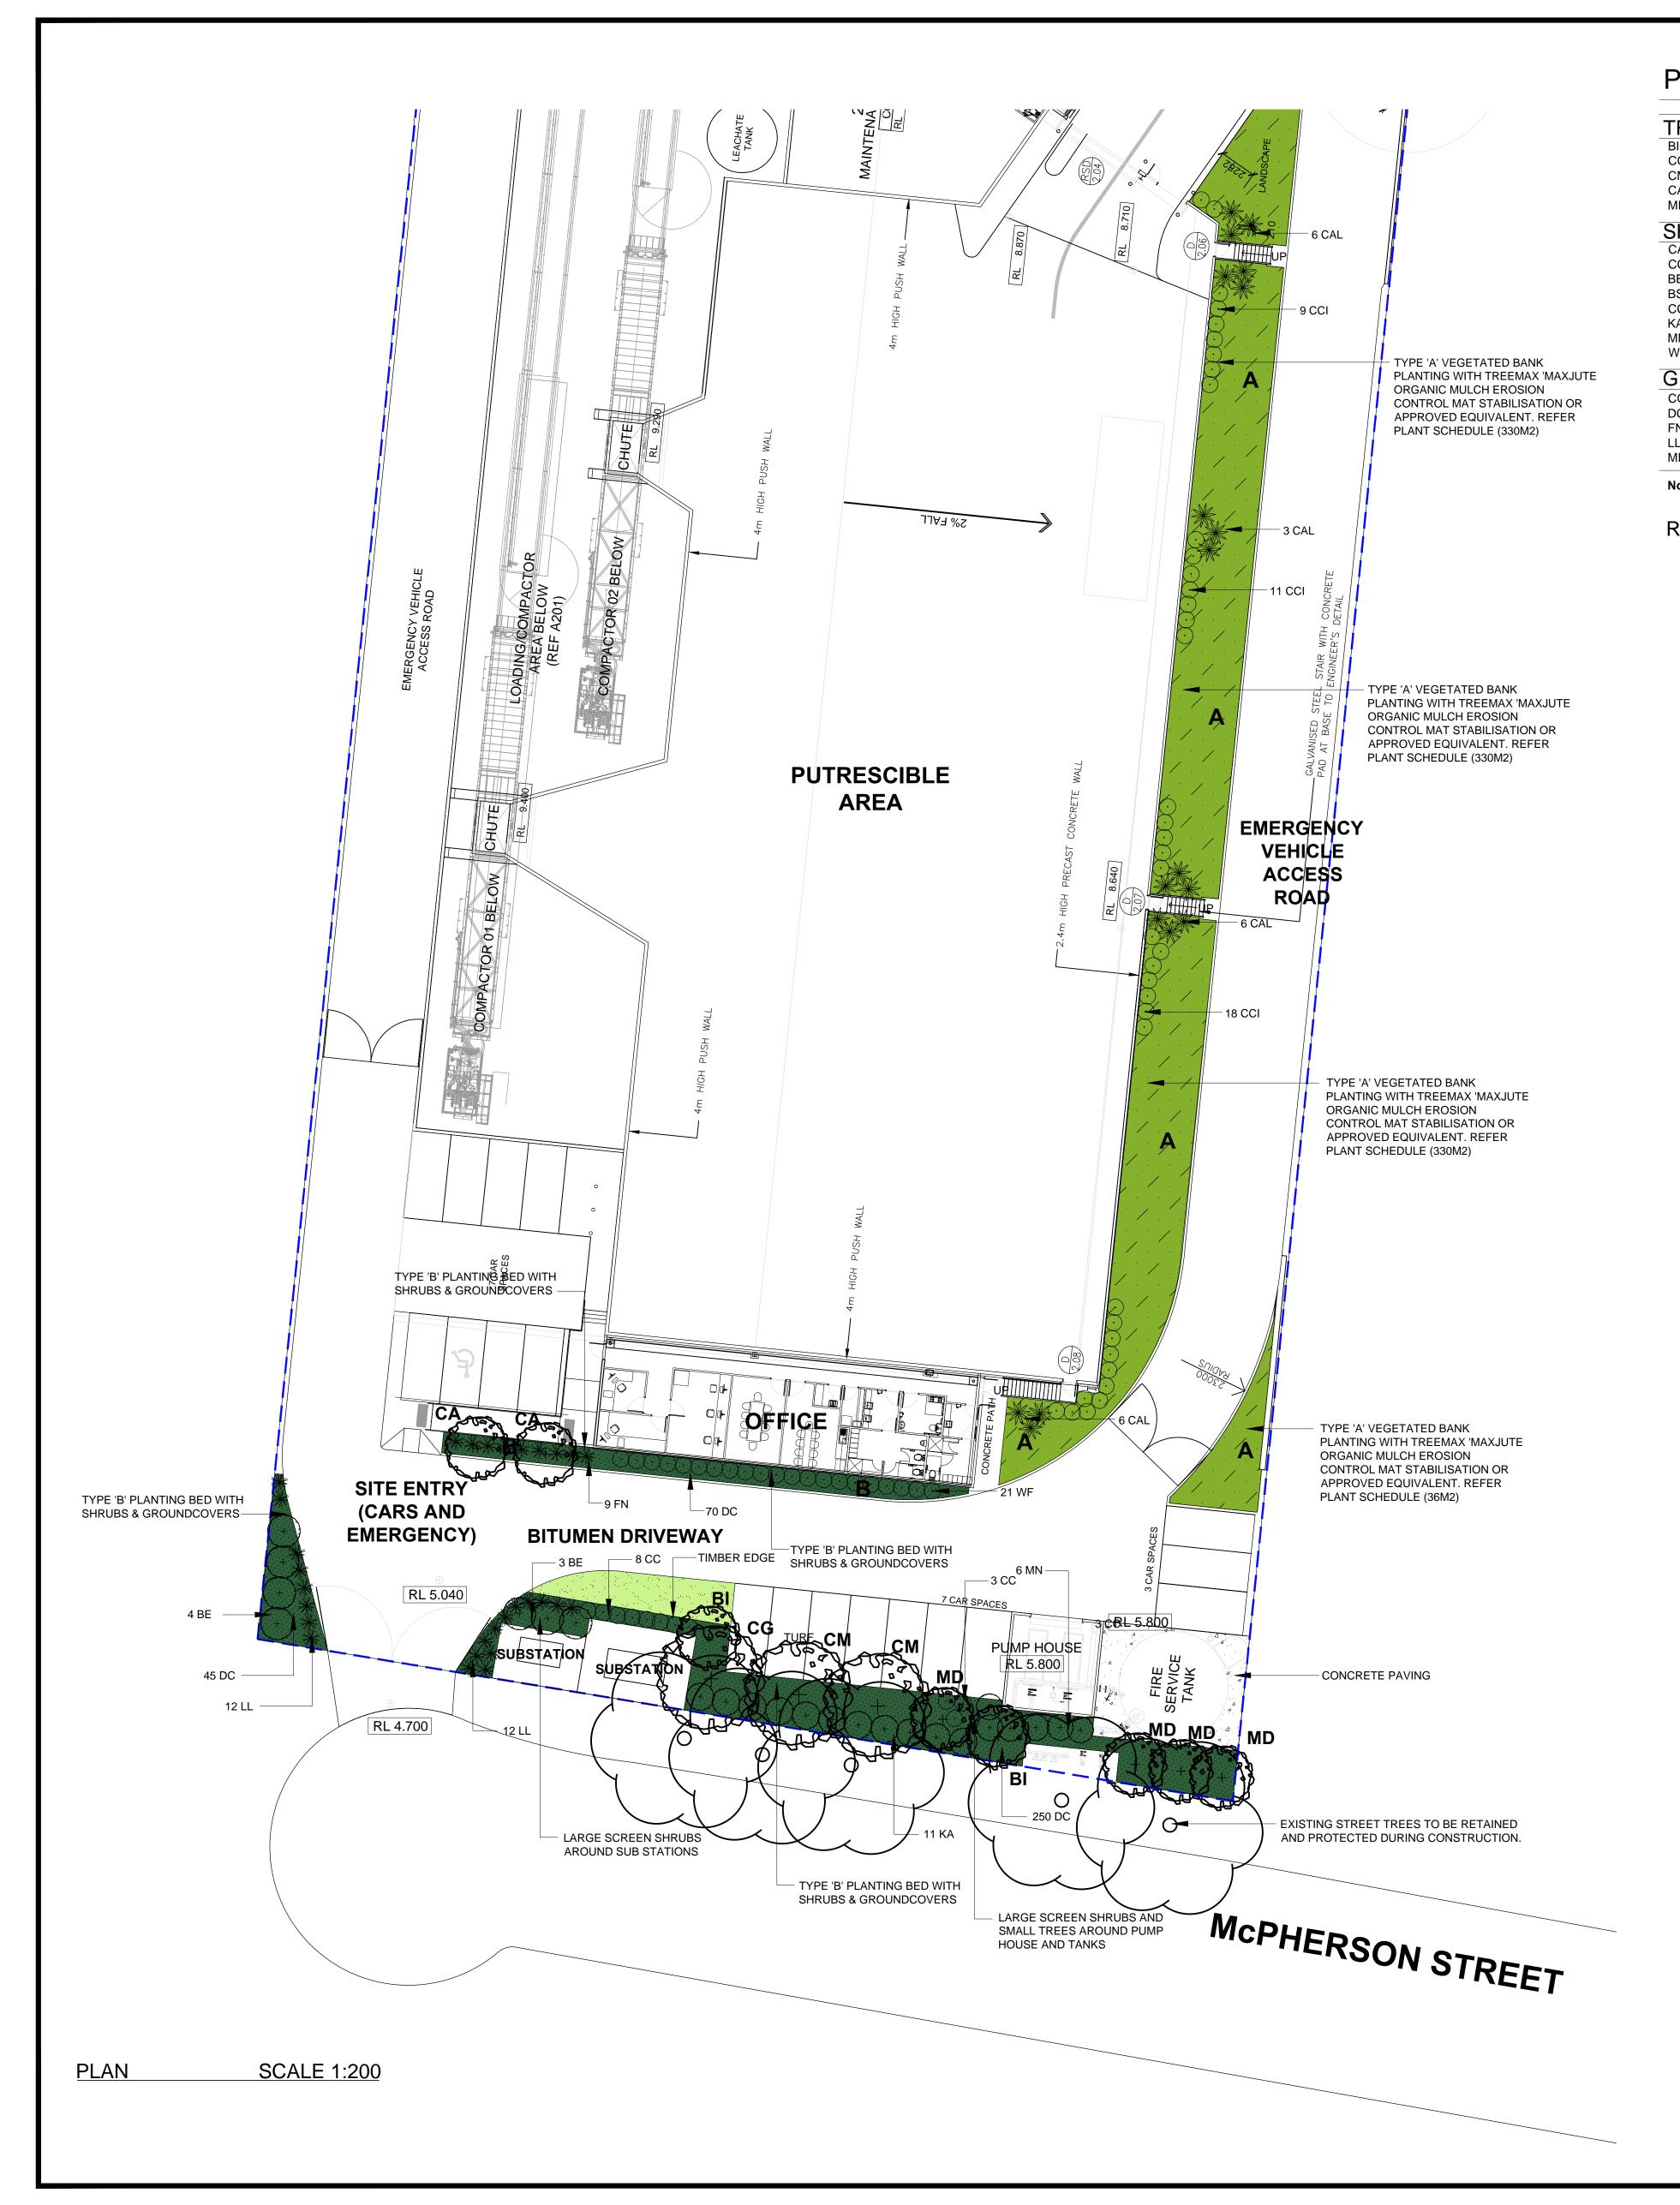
SITE SURFACE FINISHES AND LAYOUT
